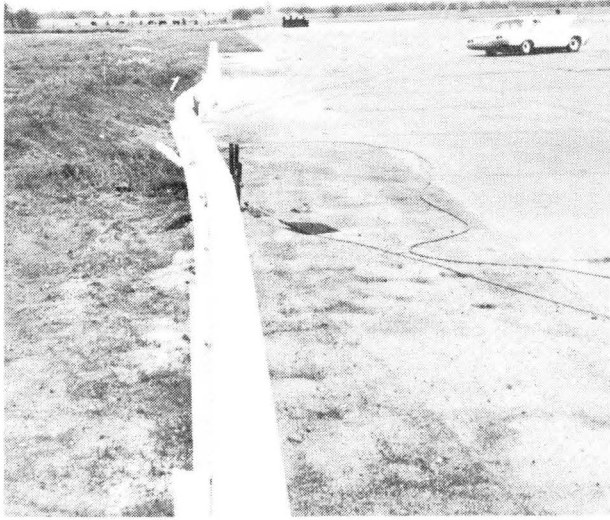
, Deflection of Bridge Rail-Guardrail, Test NY-B.
